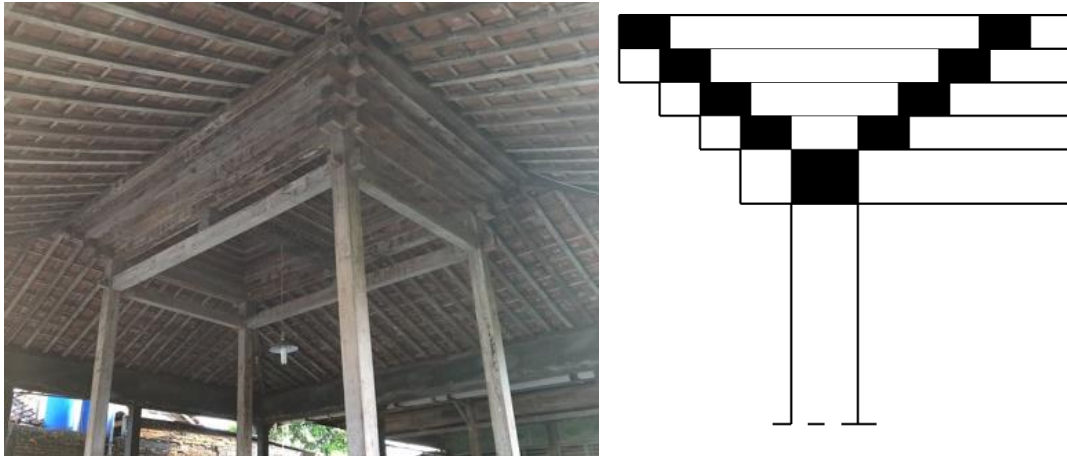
'Tumpang sari' and Tumpang sari section (right) (Johanita Anggia Rini, 2021; section modified from Saragih, 1987)
